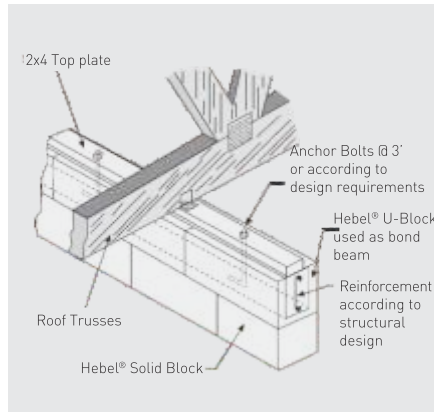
A: Anchoring wood top plate to U-Block top bond beam.
